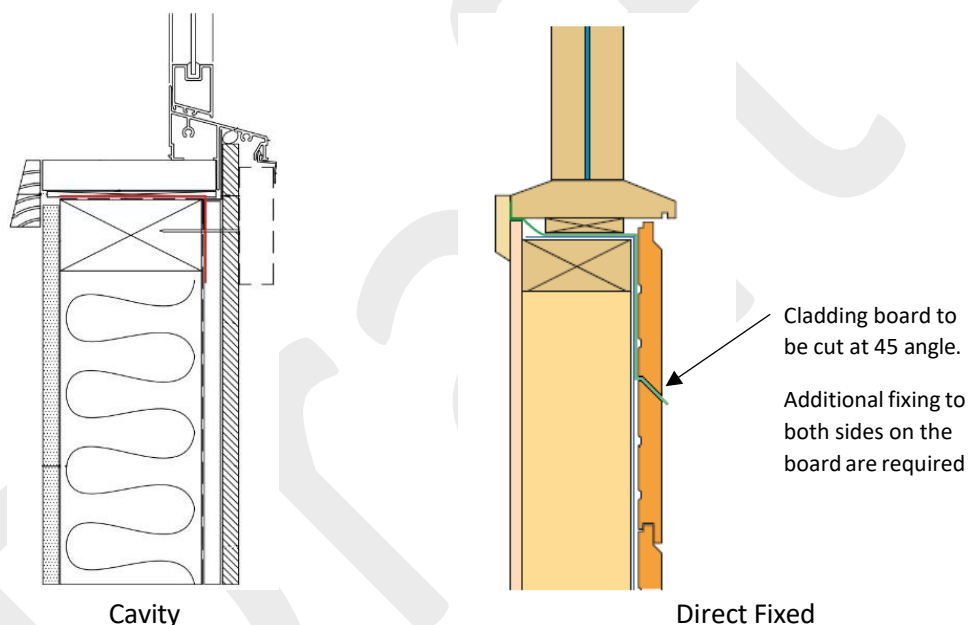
Flashing to the bottom of a window opening draining into a cavity or the external layer
